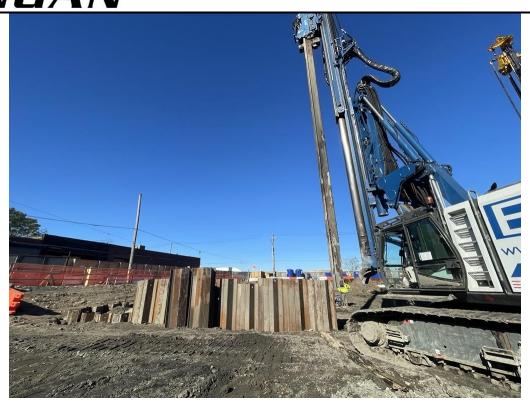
ECD advancing sheet piles for the elevator pit (facing west)
